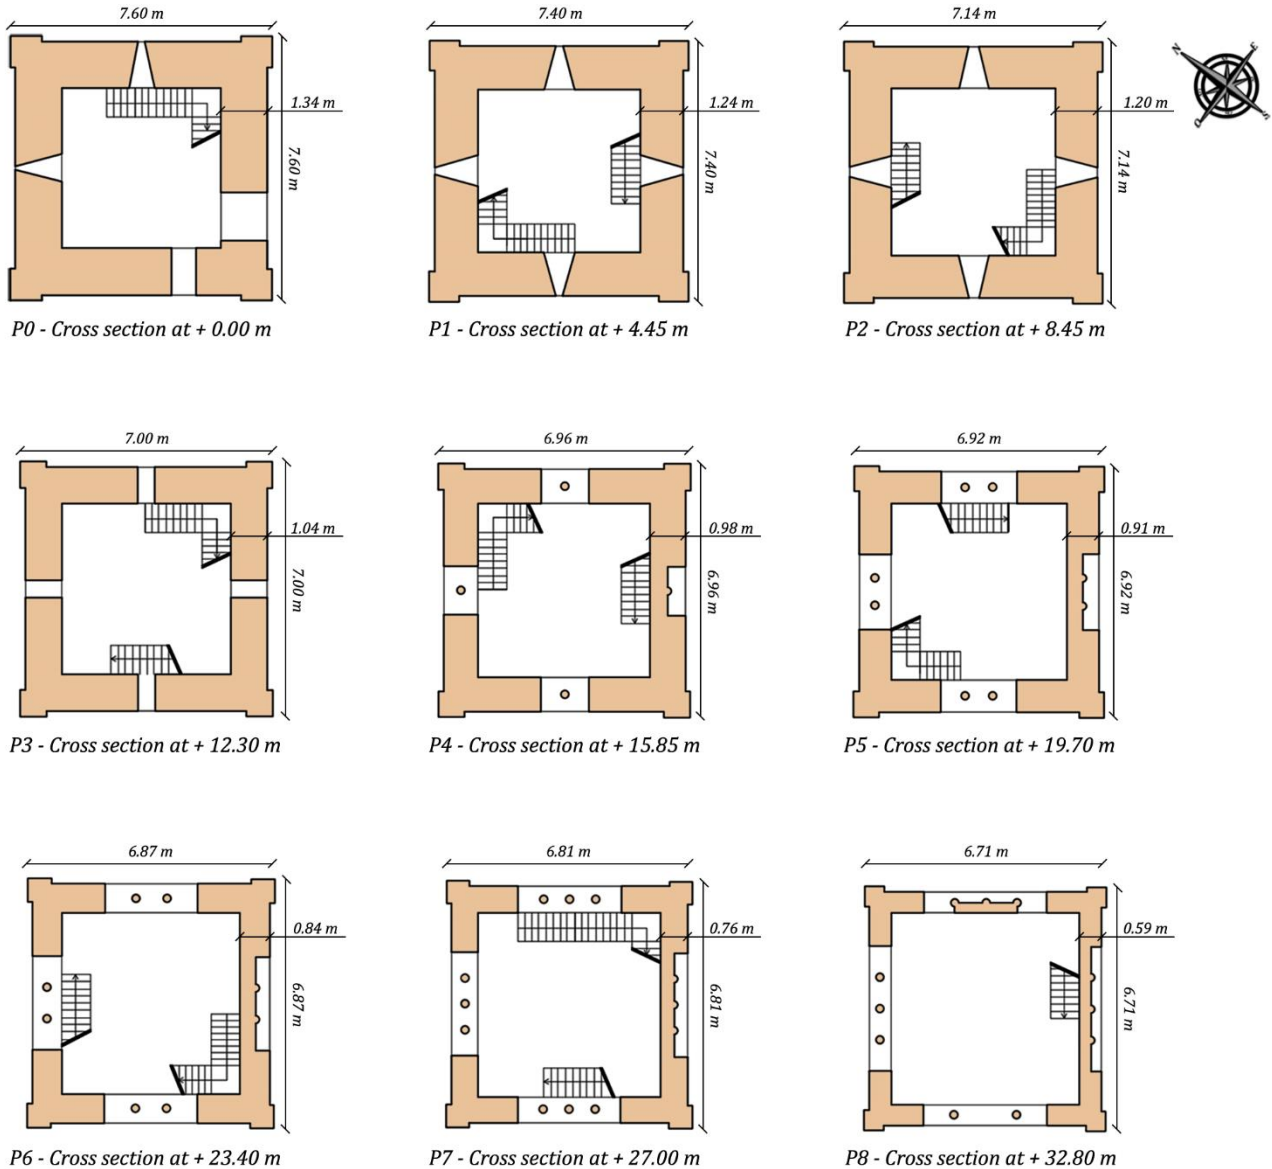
\_ Drawings of the cross sections of the bell tower of Pomposa Abbey in Codigoro (Italy)
